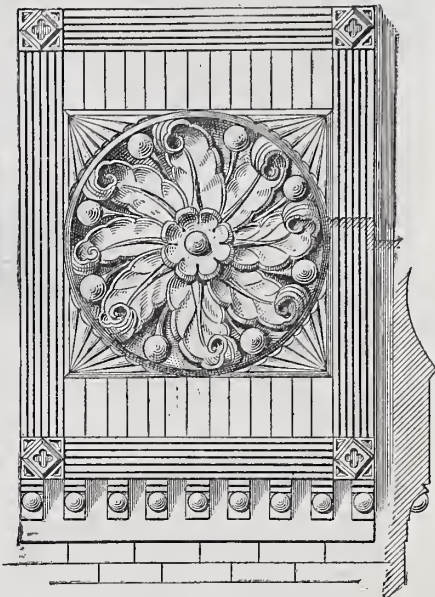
Panel in First Story, North Side.—Scale, 1/2 Inch to the Foot. Corner Pieces, No. 204. Border, No. 275a. Center, Terra Cotta. Finish Along Lower Edge, No. 67.
